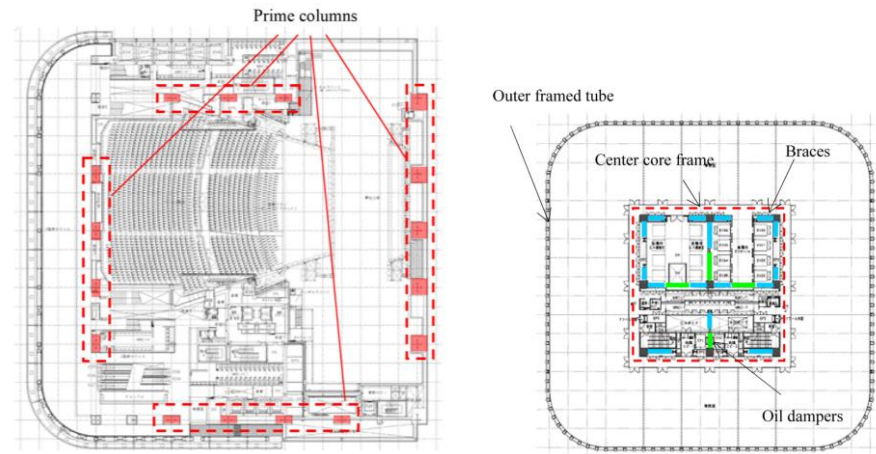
(a) basic floor layout of upper-level floors, (b) basic floor layout of lower-level floors
